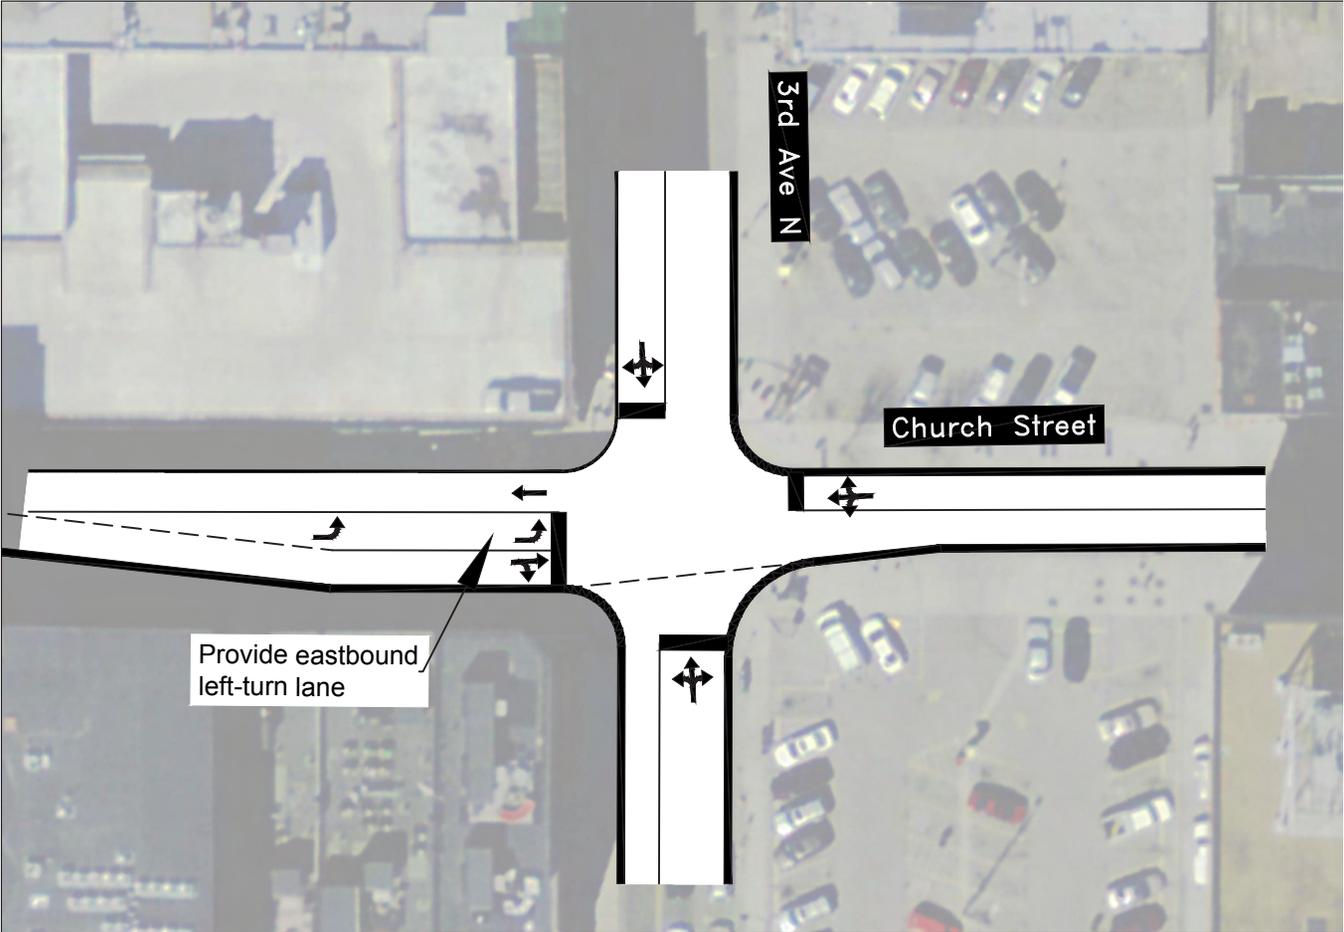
Conceptual Design: 3rd Avenue and Church Street
